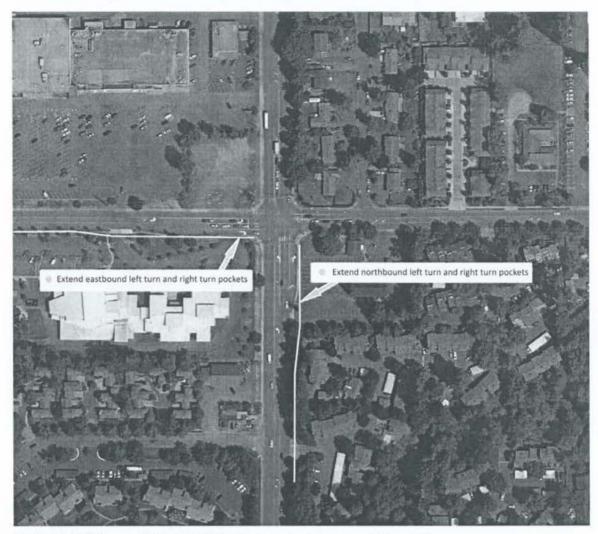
h Avenue NE & NE 132nd Street Intersection Improvements Schematic
